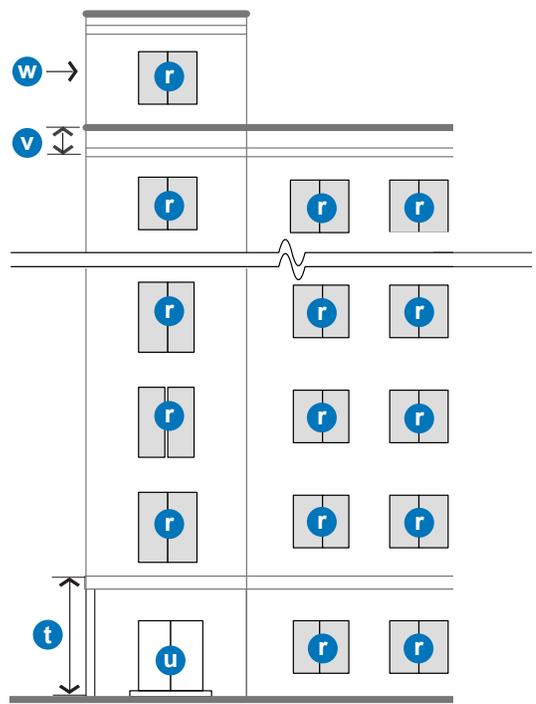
(3). General Stoop Building: Street Facade Requirements.
